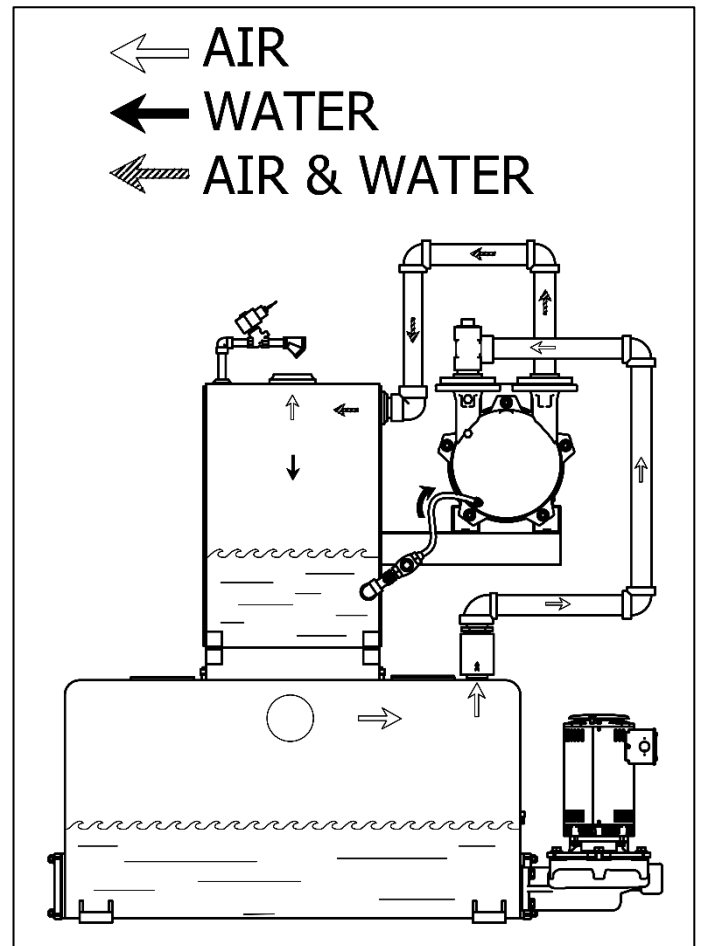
, Boiler feed flow diagram. Note: System layout is exaggerated to better show plumbing arrangement.
